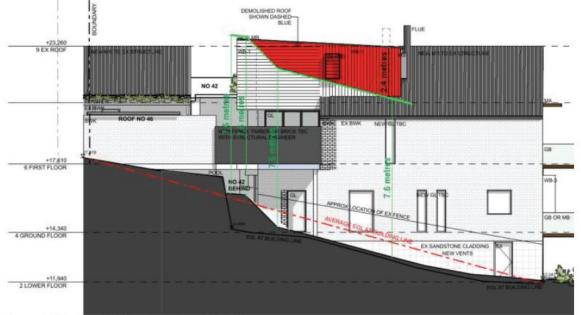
Western Building Envelope Variation Source: Annotated Architectural Plans, Watershed Design DA14 Issue G
